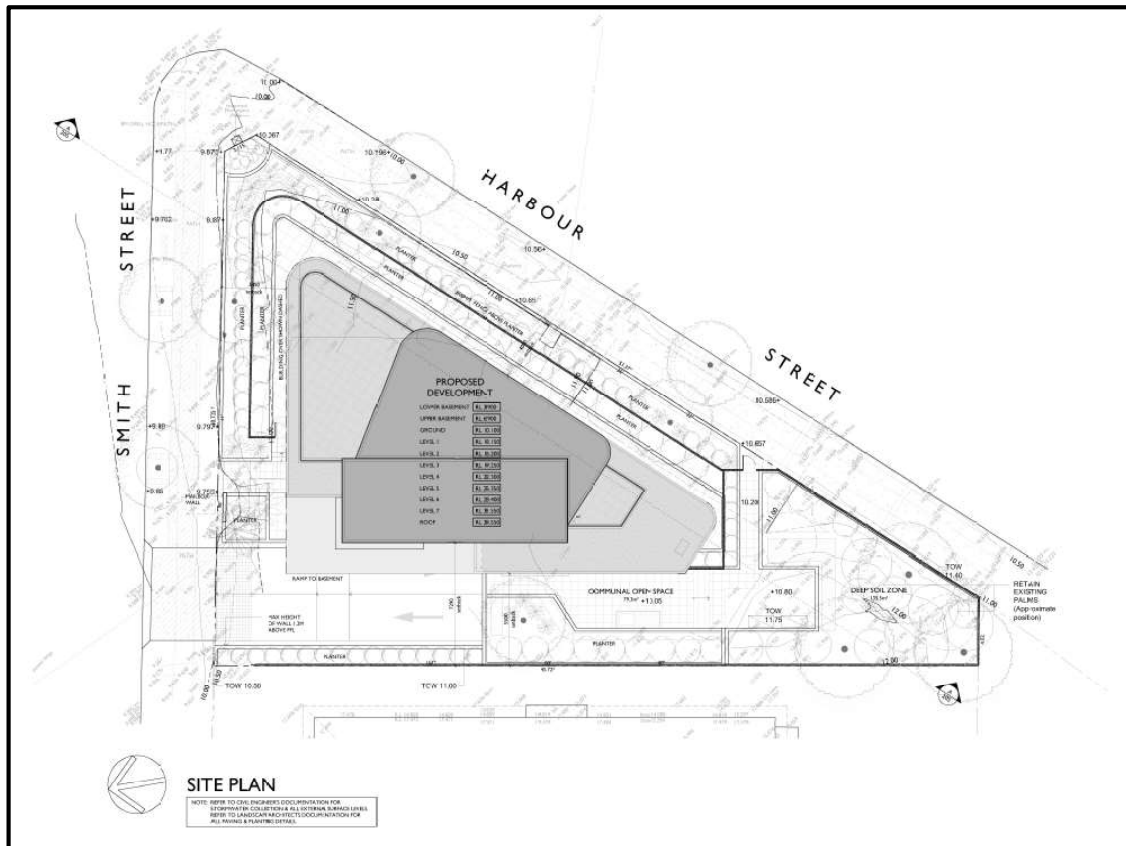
Proposed Site Plan (\*Source: ADM Architects)
